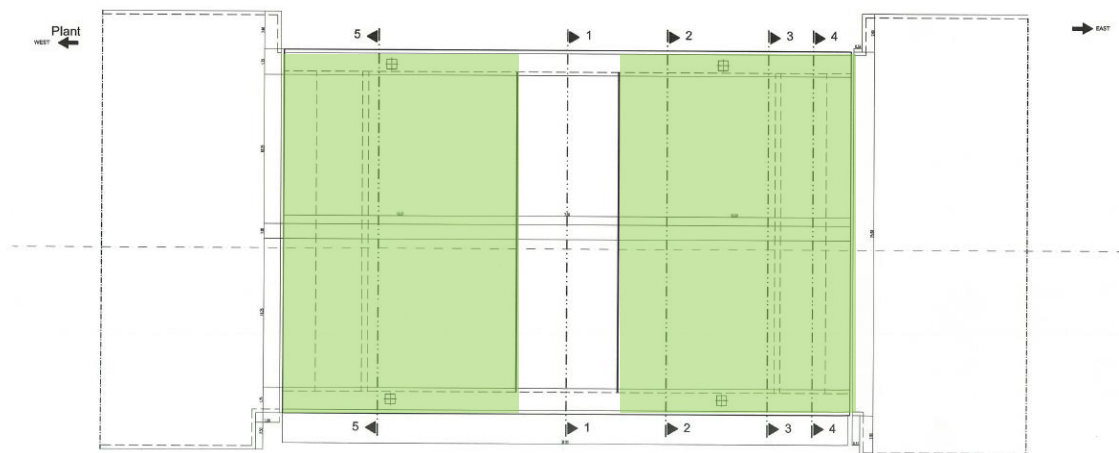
The location of cantilever arch slabs in plan of bridge
